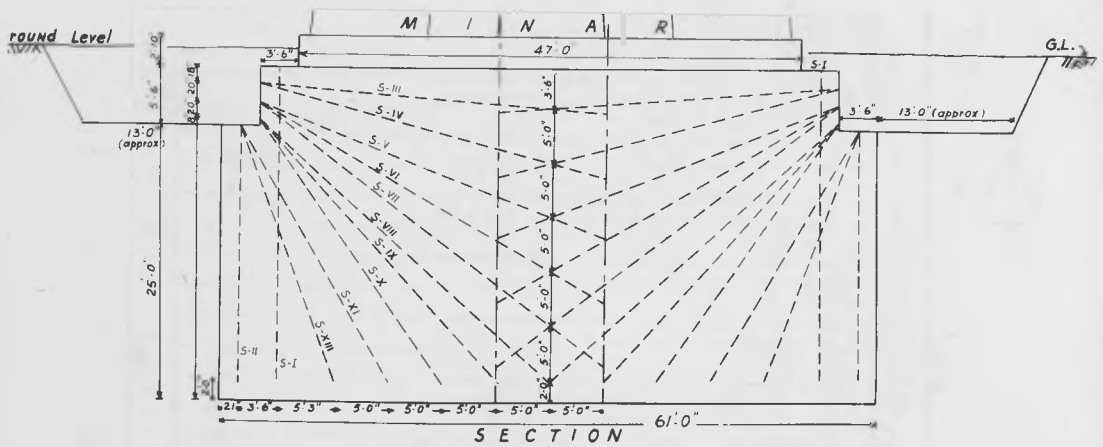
The Qutb Minar: Section of the foundation showing radial grout holes
